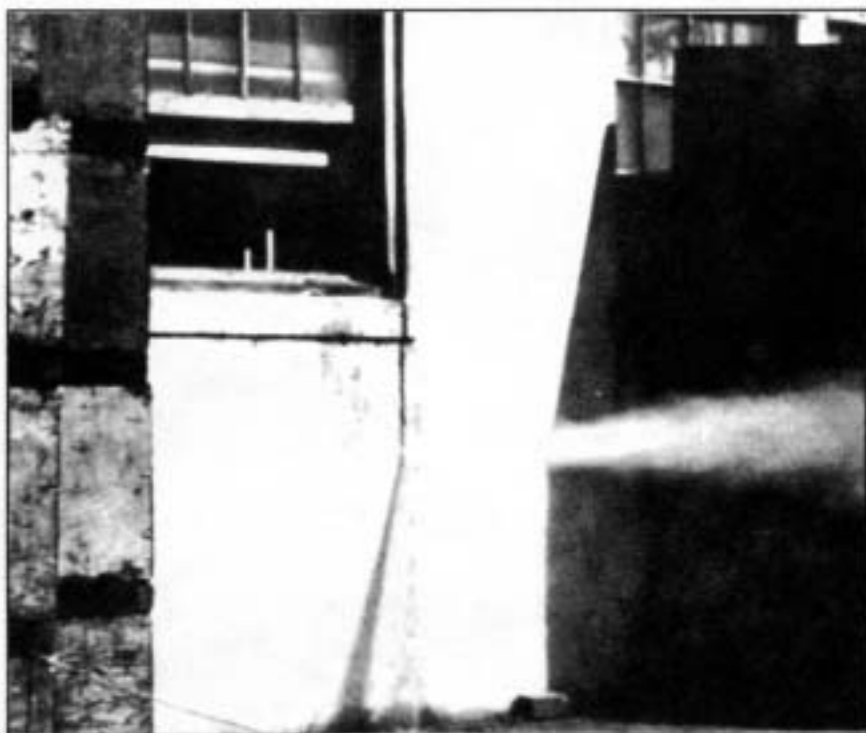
Cutting a hole in a wall. Photograph courtesy of Bill Hall.
